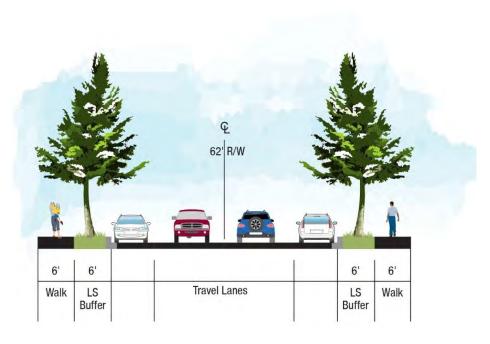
LOCAL STREET STREETSCAPE - ON-STREET PARKING
